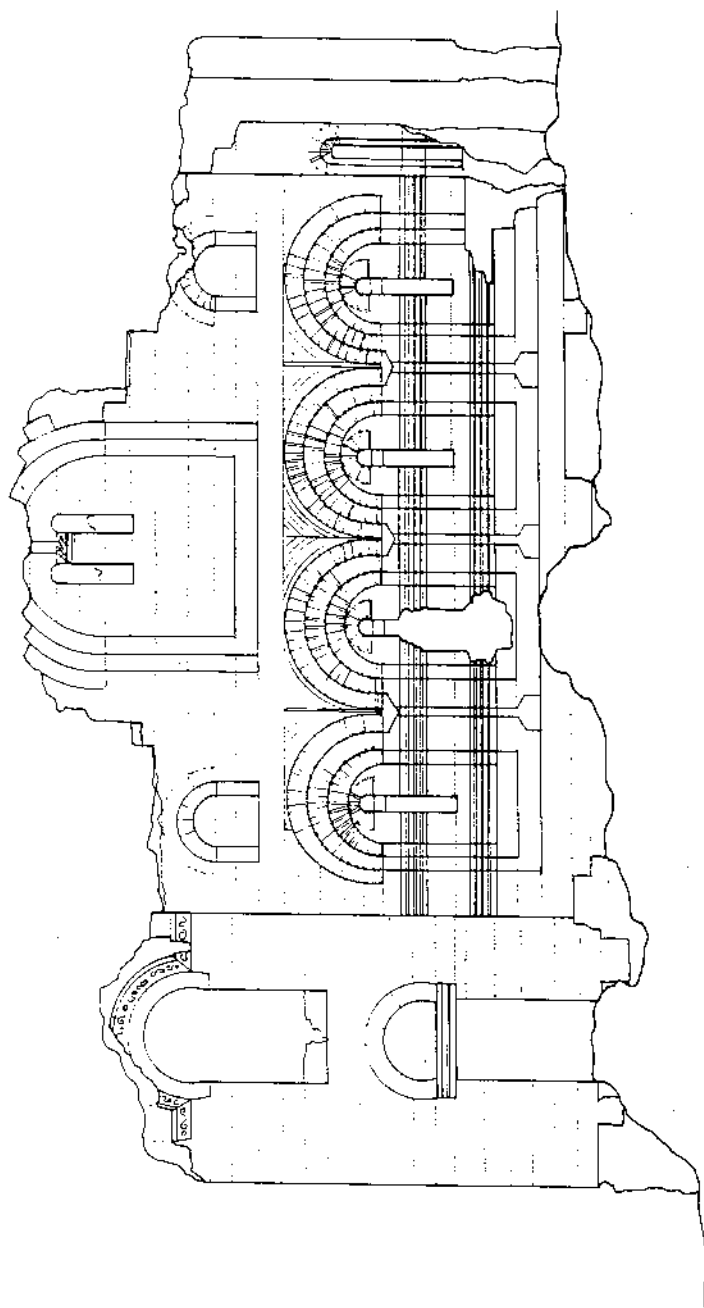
Çanlı Kilise, south facade. Elevation drawing.
